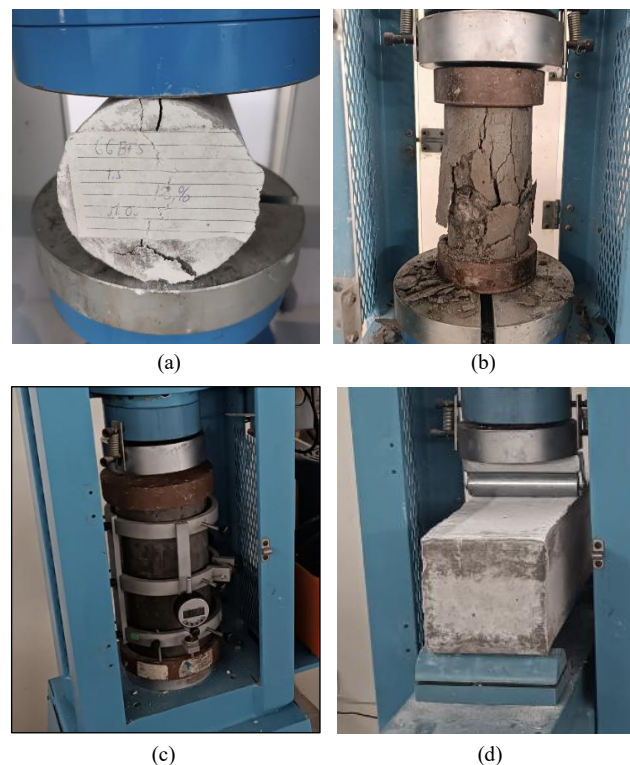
Mechanical tests on reference concrete and modified concrete with additions of 8%, 12%, 16%, and 20% GGBFS: (a) Compressive strength test of cylindrical concrete specimens (f'_c); (b) Splitting Tensile Strength of Cylindrical Concrete Specimens (f_t); (c) Flexural Strength of Concrete (Using Simple Beam with Center-Point Loading) (f_r); (d) Static Modulus of Elasticity Test for Concrete in Compression (E_c).
